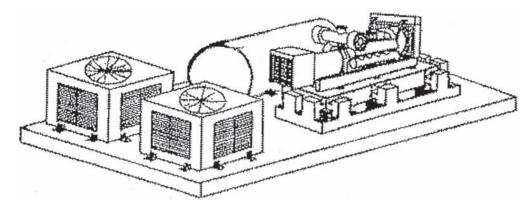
Multi-hazard mitigation for mechanical equipment. The equipment is elevated on a concrete slab to protect it from flooding, and the bracing installed at the bases of the HVAC units and the placement of interconnected equipment on a single slab protects the equipment from damage during an earthquake. Illustration courtesy of FEMA.
